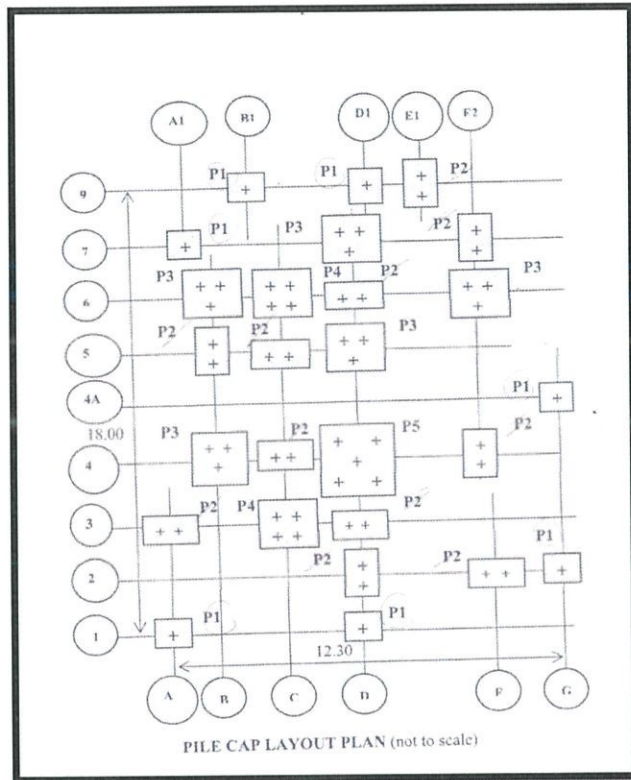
(iv): Example of Pile Cap Layout Plan
